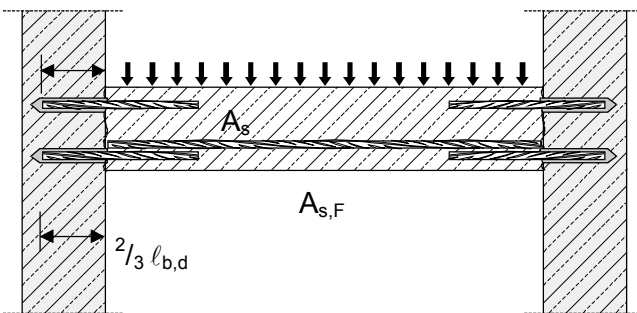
End anchoring of slabs or beams, designed as simply supported
